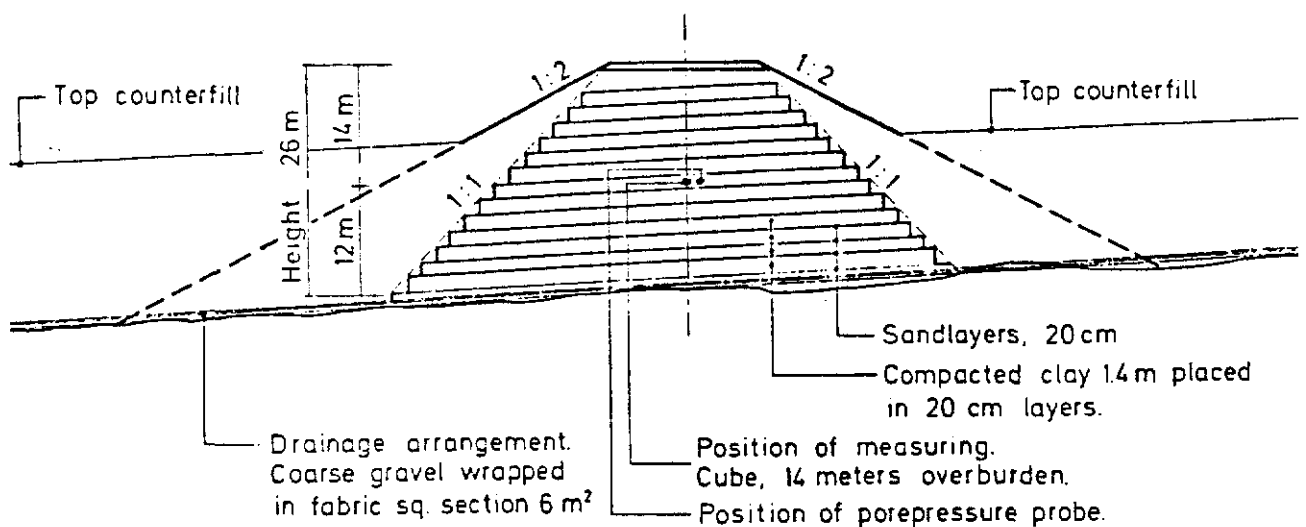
Cross section of compacted fill with cube of the measurement of horizontal and vertical stresses.
